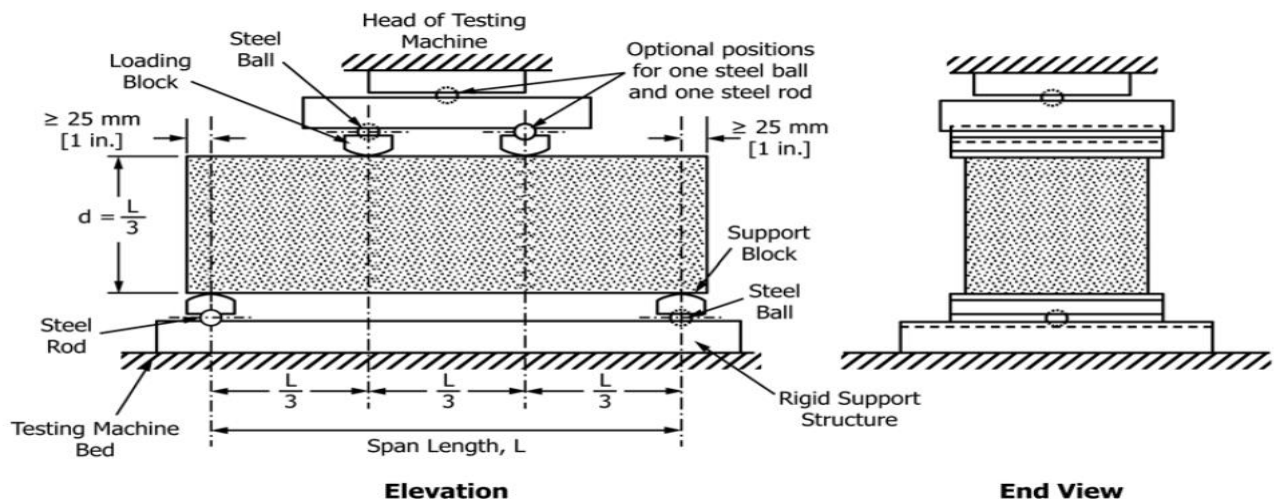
Arrangement for Loading of Flexural Test Specimen.
